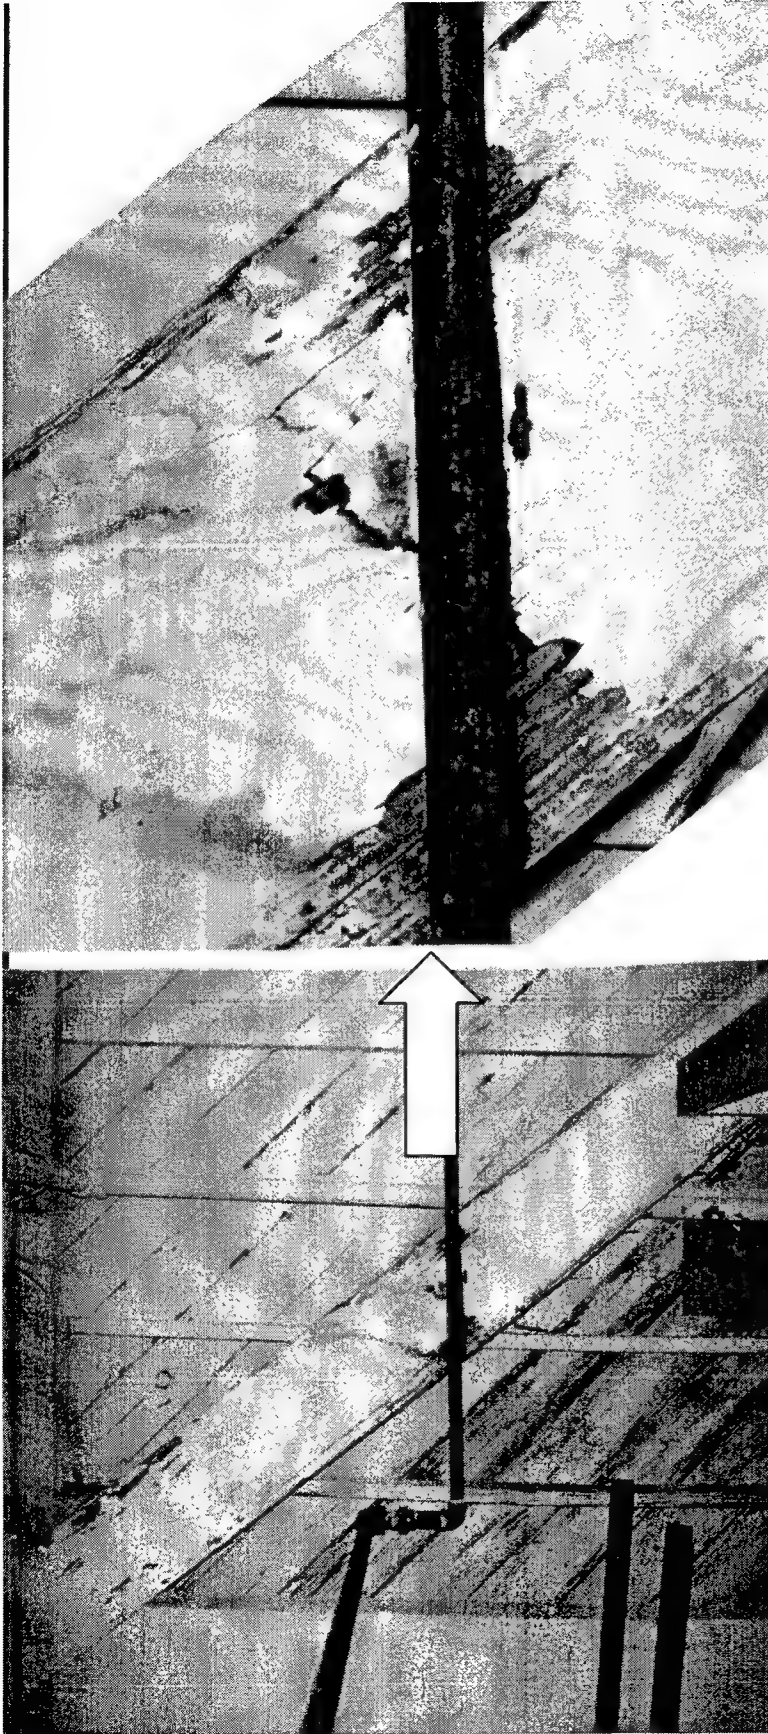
Tension failure in diagonal member PN of Truss 38, Area A.
